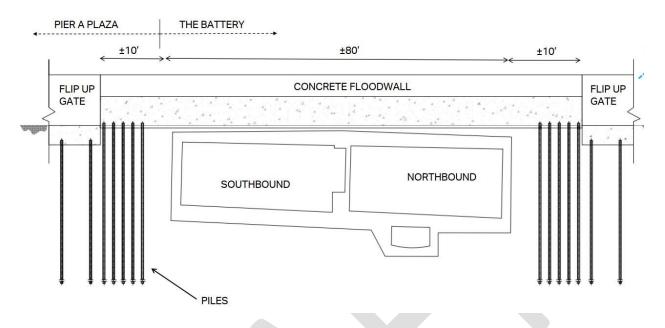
Exposed Floodwall Foundation over the Battery Park Underpass
